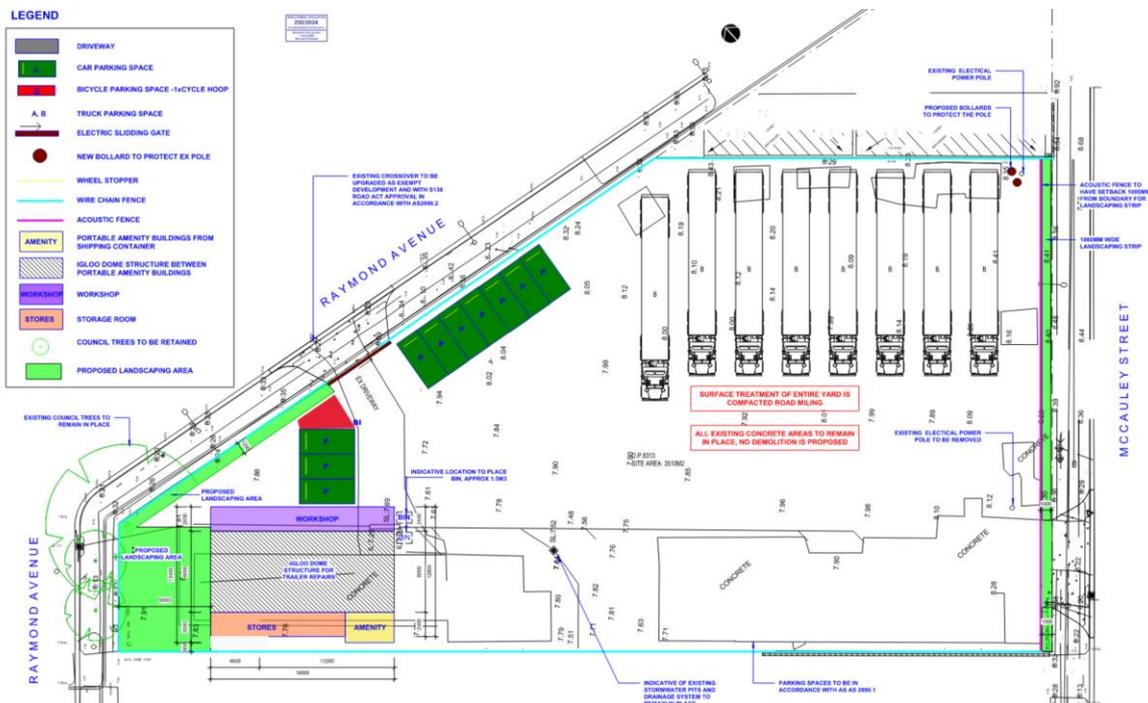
Proposed site plan (Source: 5S Projects Consulting Engineers)
